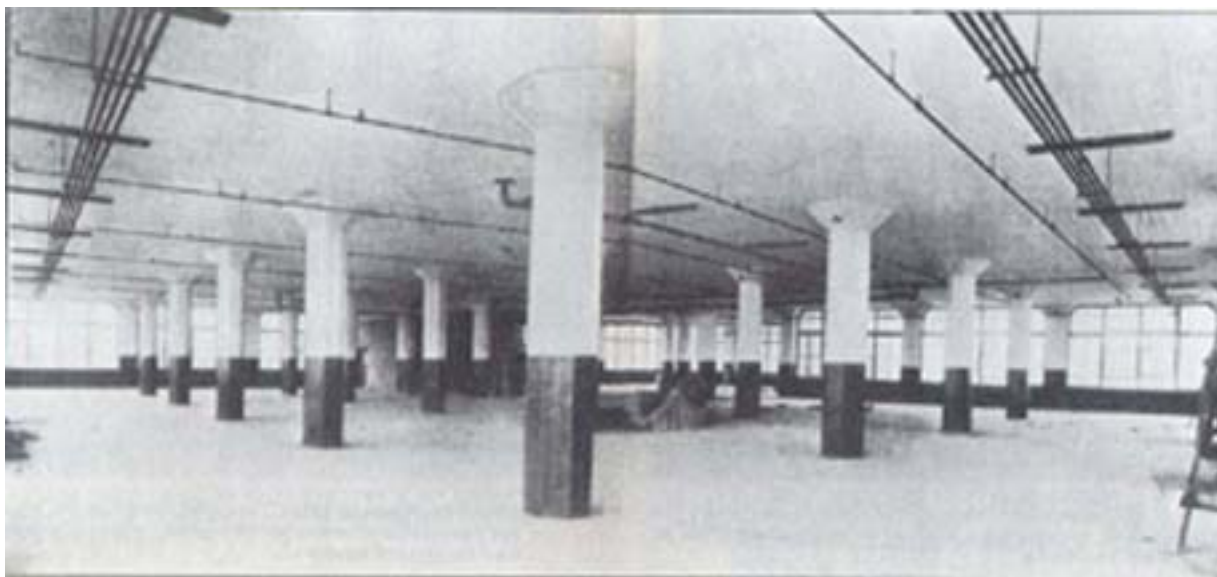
Interior of the A. T. Wall Building. Showing mushroom column, flat-slab construction.
